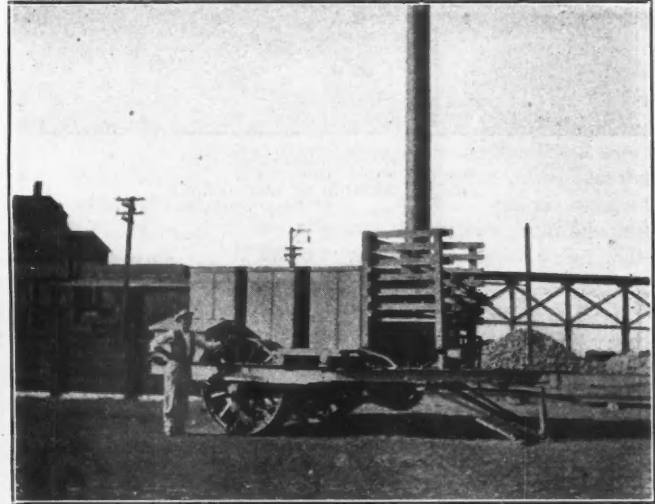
TRUCK CARRYING AUXILIARY ENGINE
